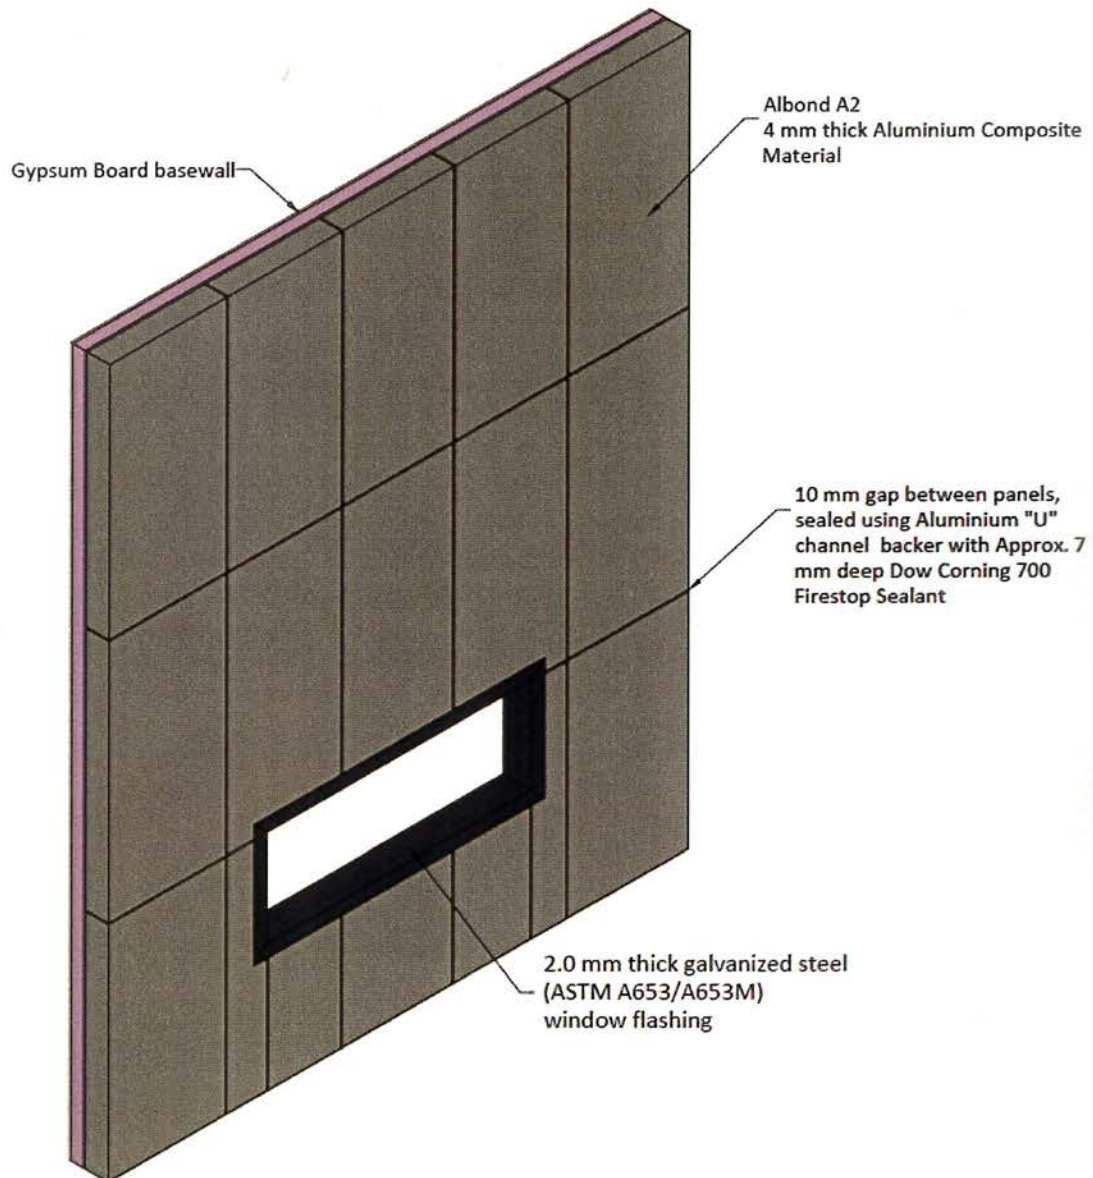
Aluminium Composite Panel Exterior Wall Cladding System – Typical Details
